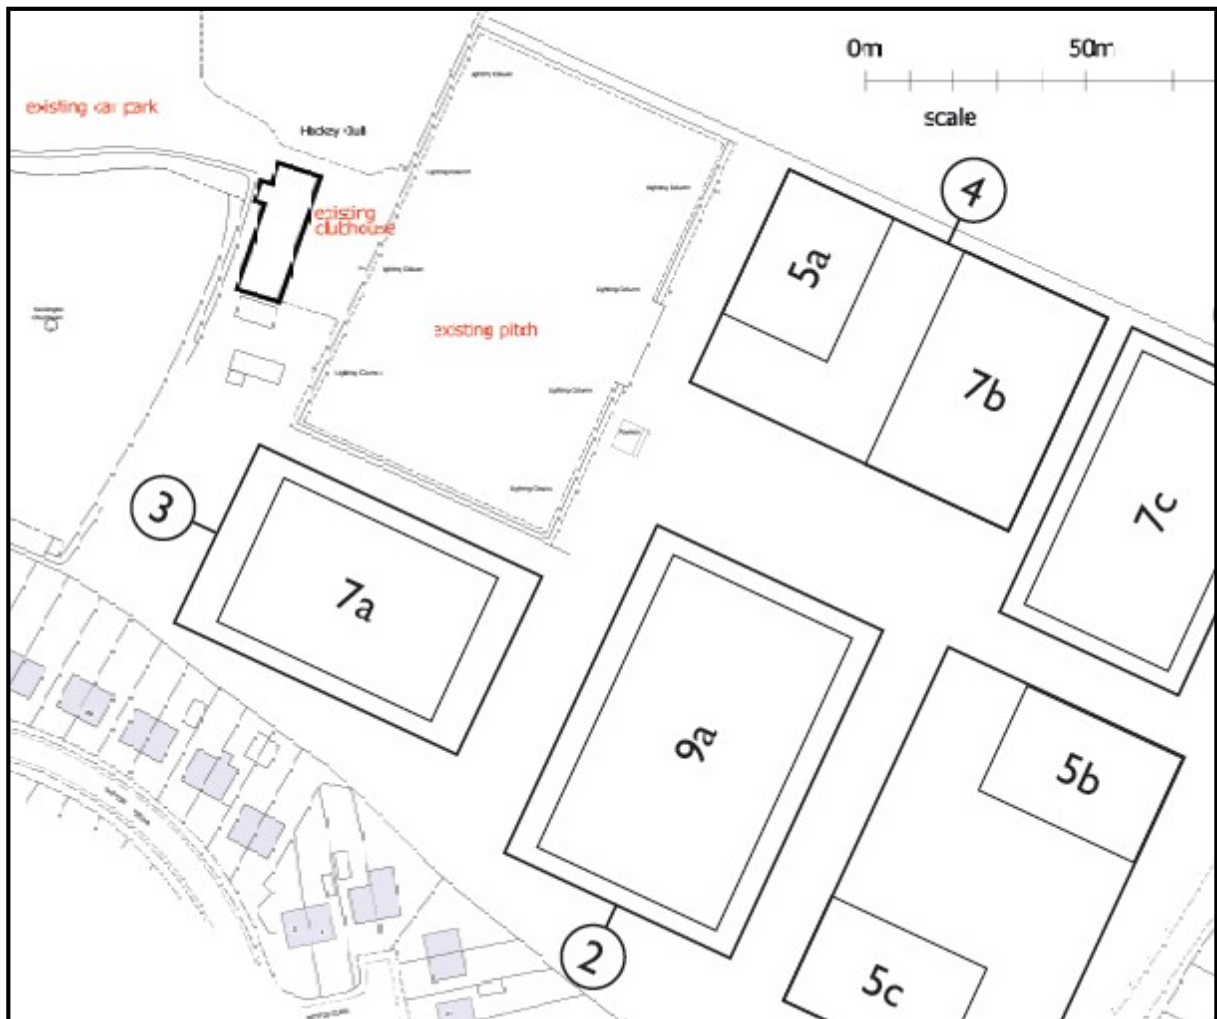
Existing wider Hockey Club Site Layout with pitches marked
